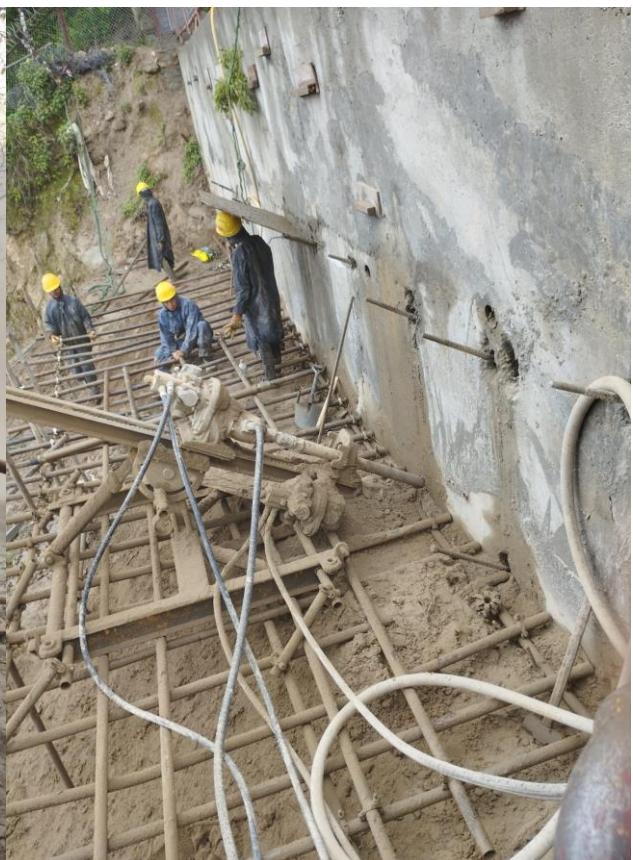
Horizontal Drilling by DTH for Soil Nailing at Dusit Thani Himalayan Resort, Kabhrepalanchwok
